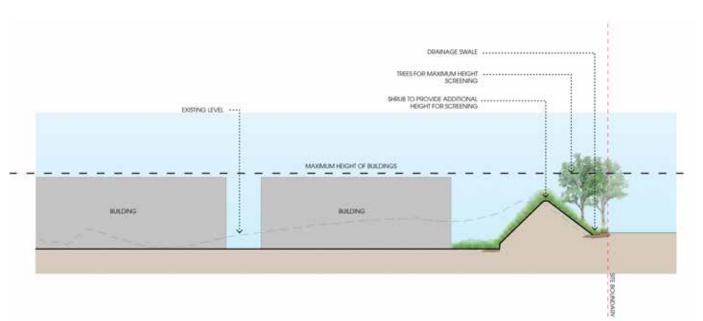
SECTION, THE NEW BUND WITH 15M HIGH BUILDINGS
